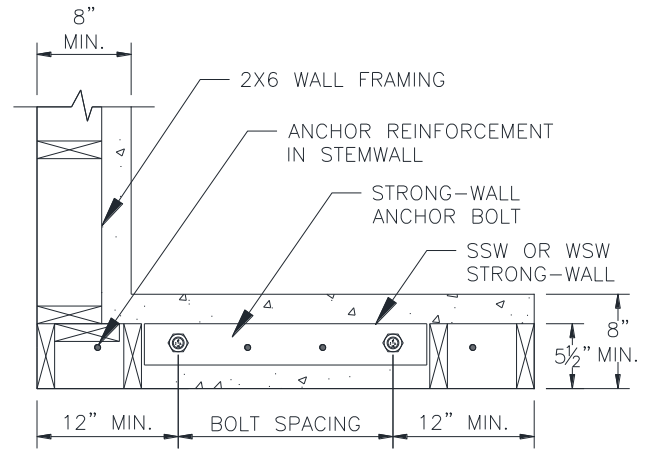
Strong-Wall Flush with Inside Face of 2x6 Wall – Plan View
